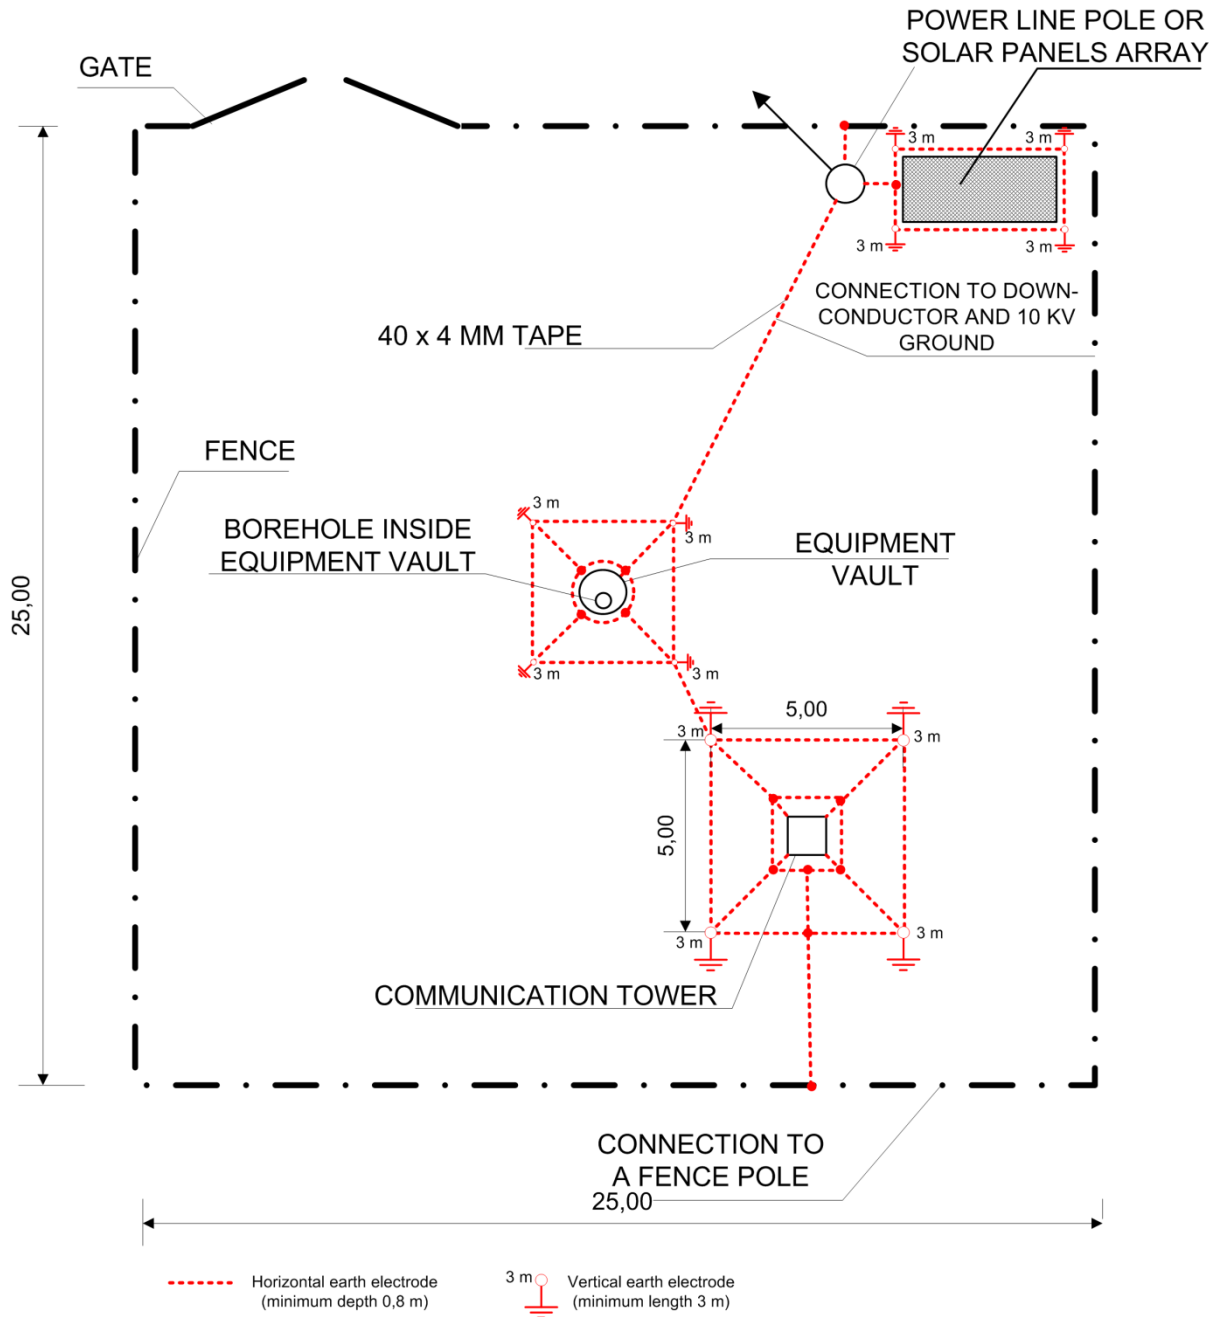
Example of schematic design of earth termination system for an IMS seismic array element. A minimum of 4 earthing rods per structure (communication tower, equipment vault, and solar panel array) shall be installed
